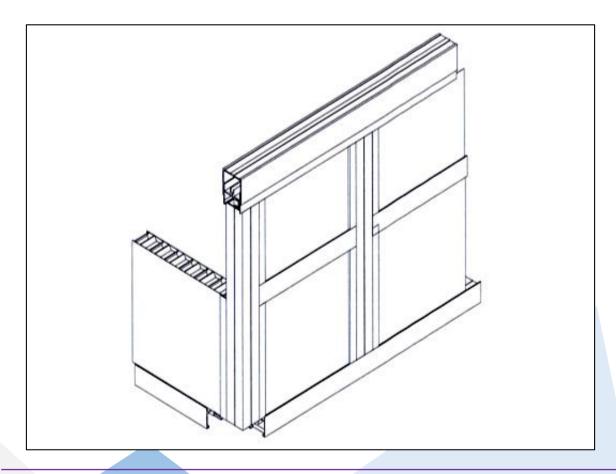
Panel Top and Bottom Track Joint-Double Sided Wall
